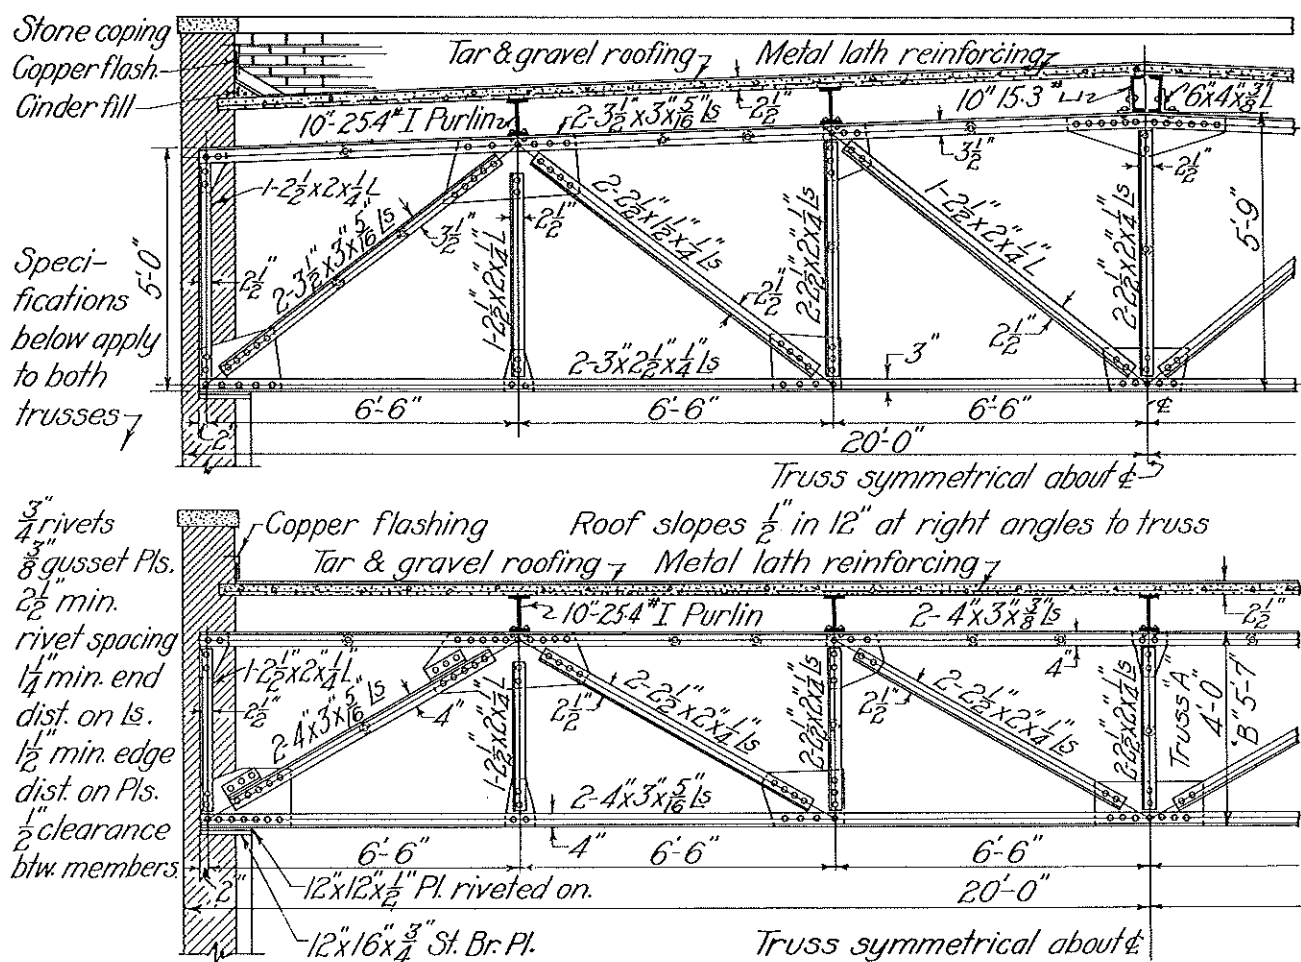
Truss detail for building shown in Figs. 21.16 and 21.17.
